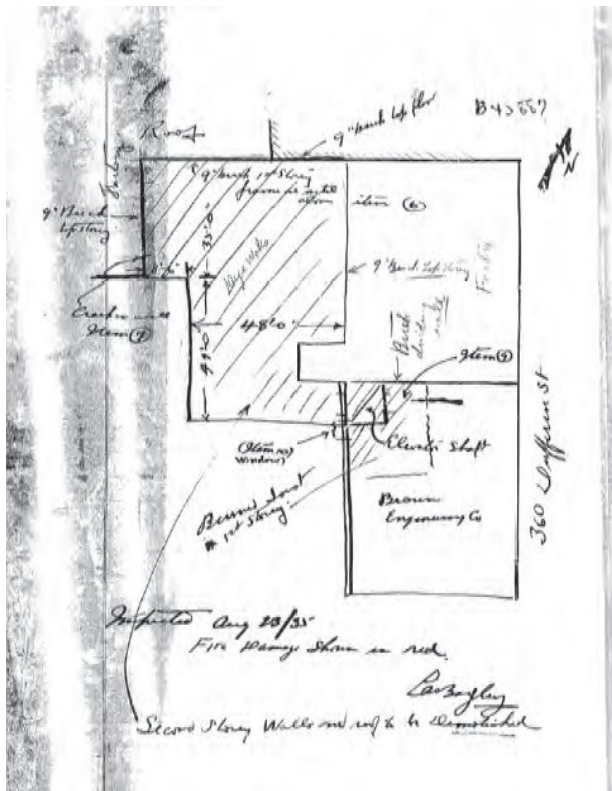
August 1935 sketch showing fire damage caused to the earliest, northwest quadrant buildings on the Dominion Radiator site, particularly the property at 376R Dufferin Street and the northwest corner of 360 Dufferin Street. (City of Toronto Archives)
